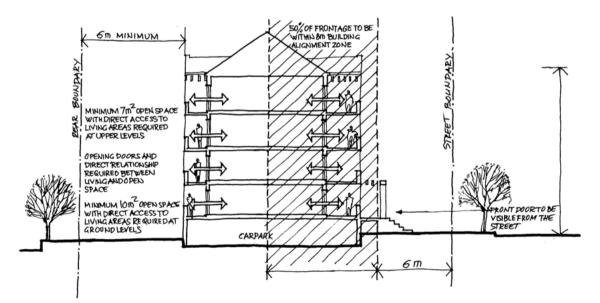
Cross section - residential flat building.
